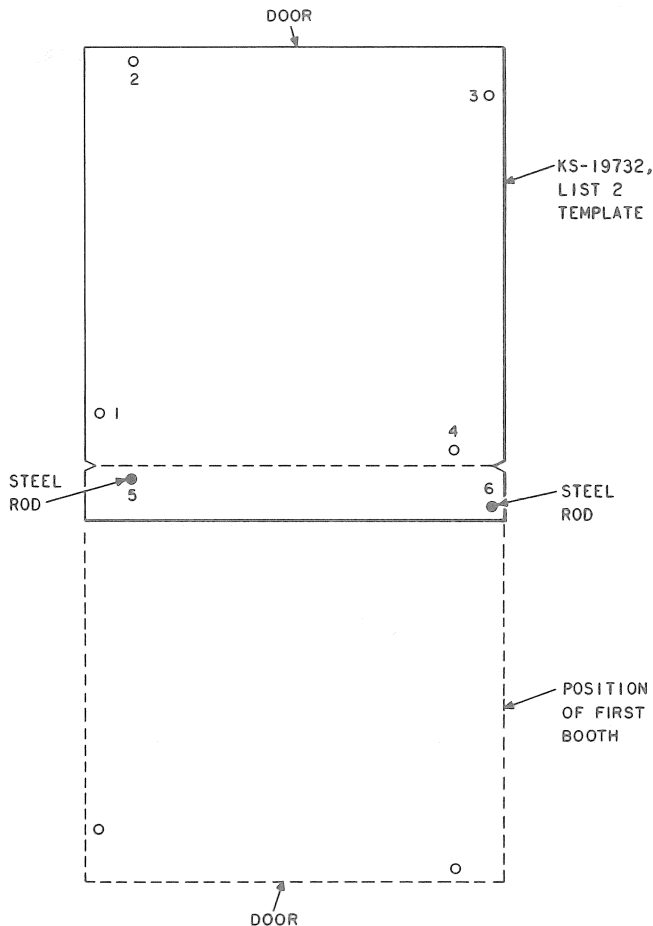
Back-to-Back Layout for Drilling Mounting Holes
